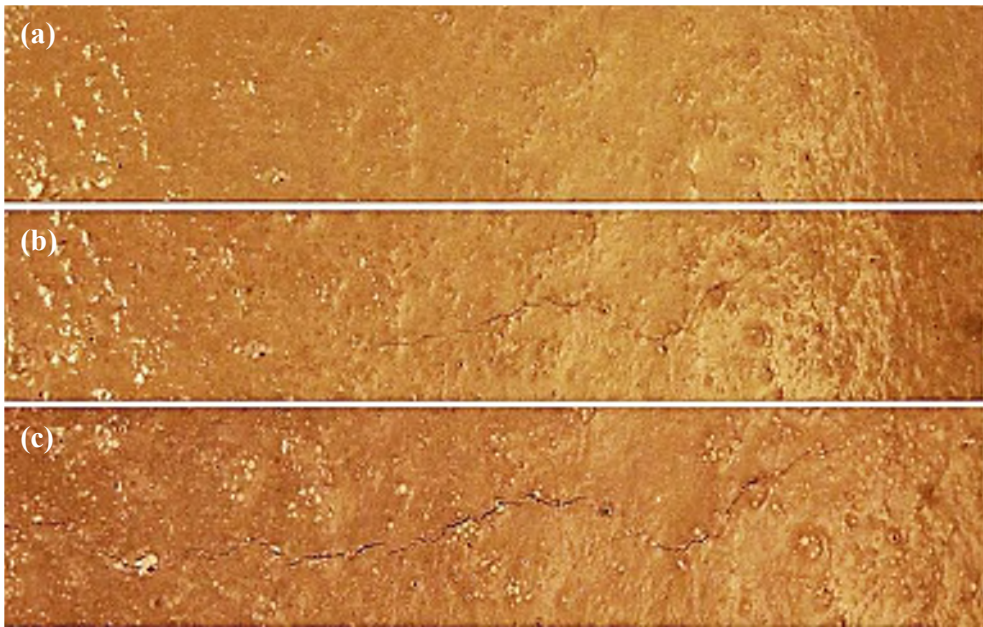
The cracking process of the plain concrete (REF) in Paper III: a) immediately after casting; b) shortly after the crack initiation time, i.e. 146 min after casting; c) at the end of the test, i.e. 18 h after casting.
